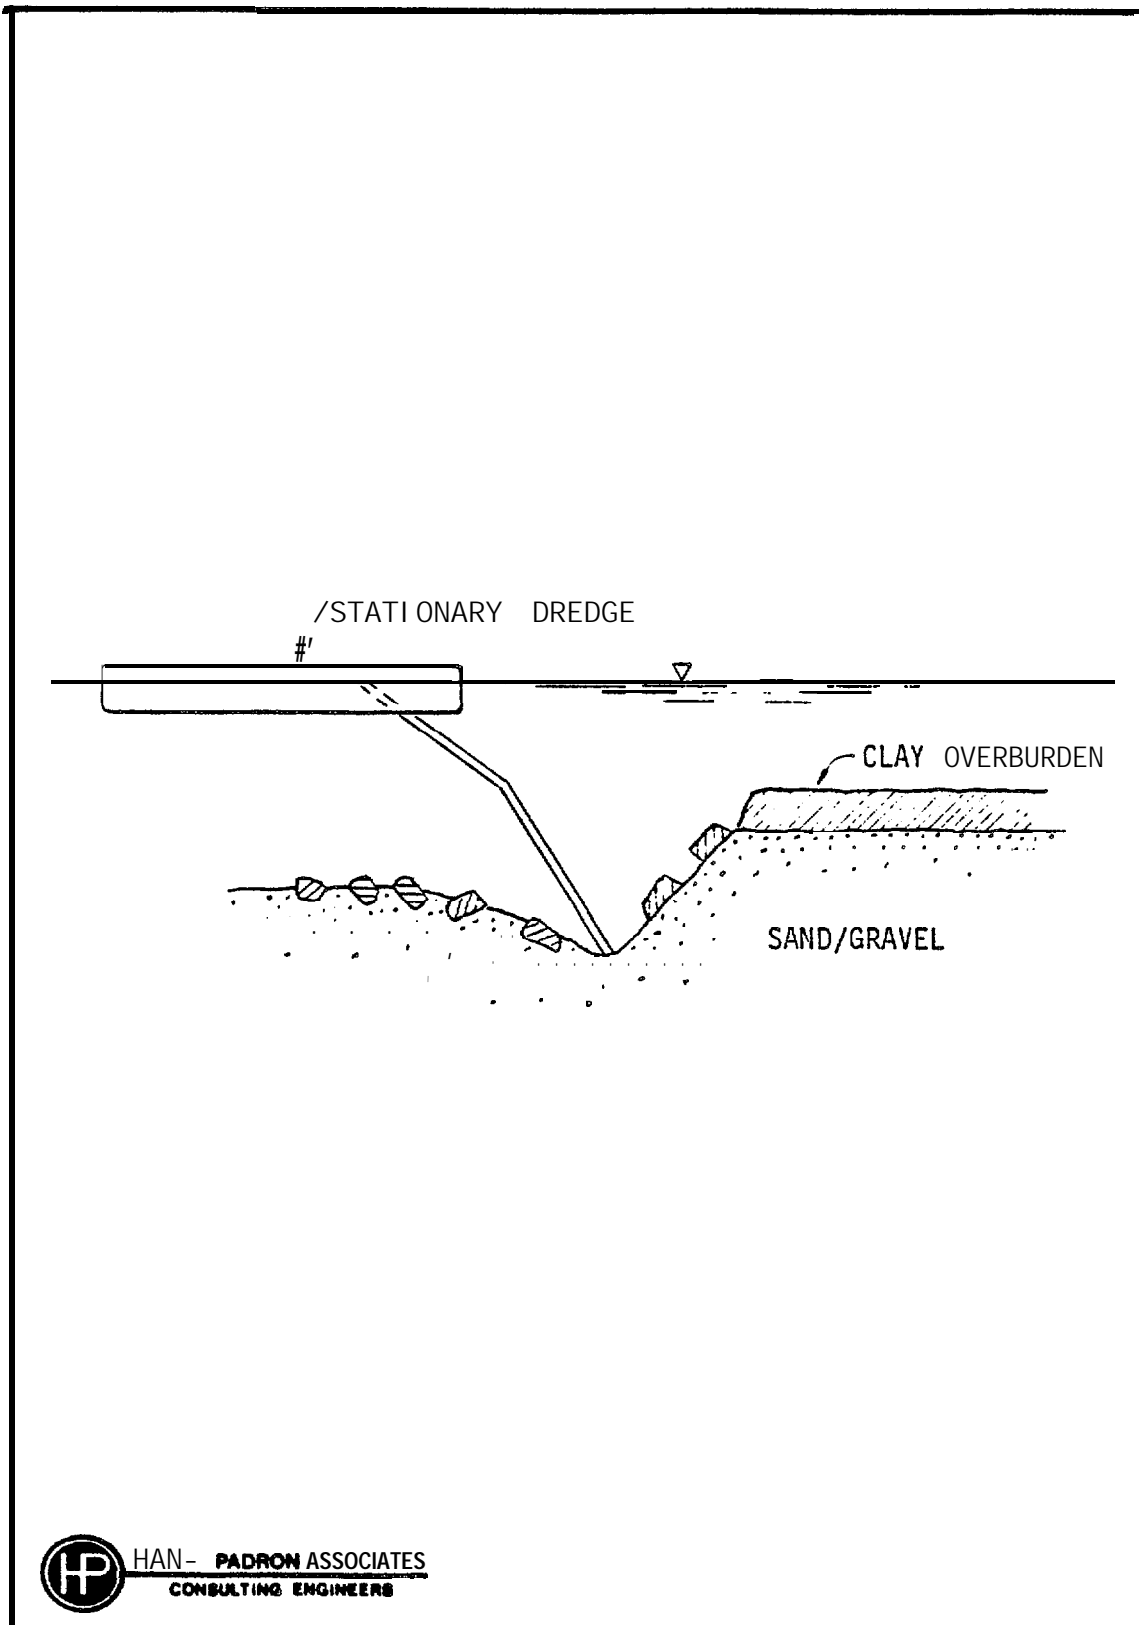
Excavation of sand/gravel deposits with clay overburden.
